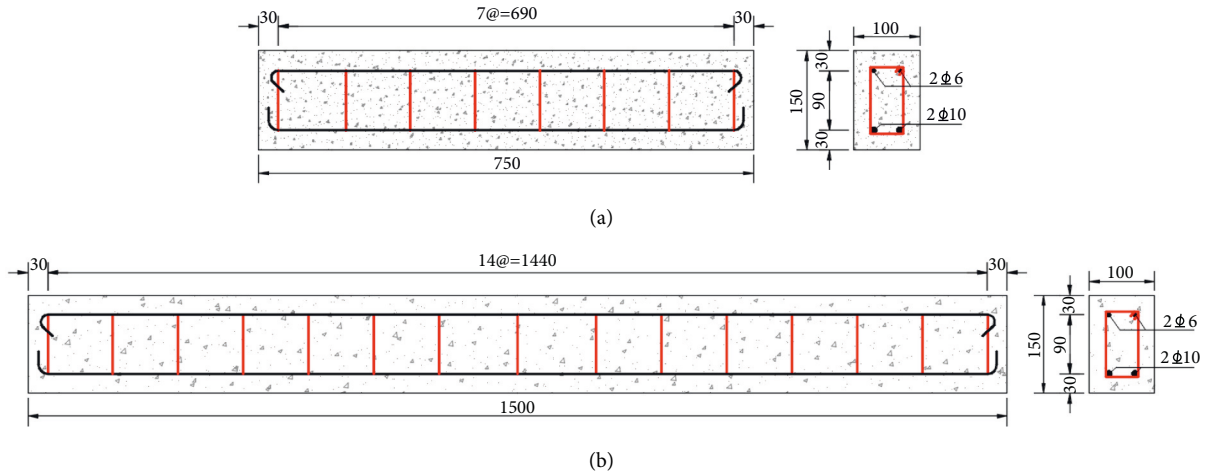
The arrangement of stirrups and longitudinal reinforcement of specimens. (a) Specimens in groups SP3 and SP5. (b) Specimens in group SP4 (unit: cm).
